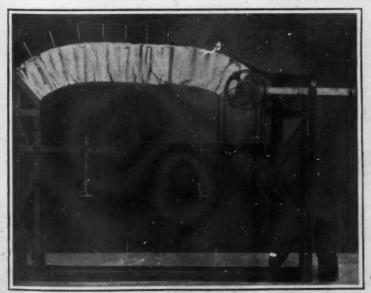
Arch under load, showing breaks at crown and abutments.
